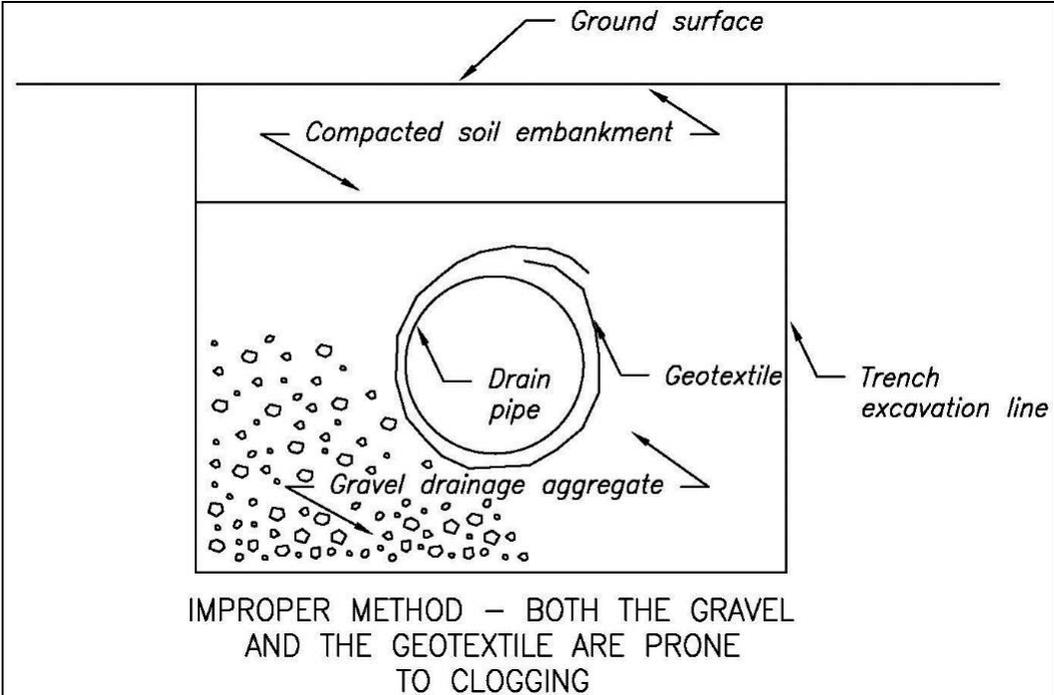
Toe drain formed by placing a geotextile filter around a perforated drainpipe surrounded by a gravel aggregate drain. This method is prone to clogging if the gravel does not filter the surrounding soil embankment.
